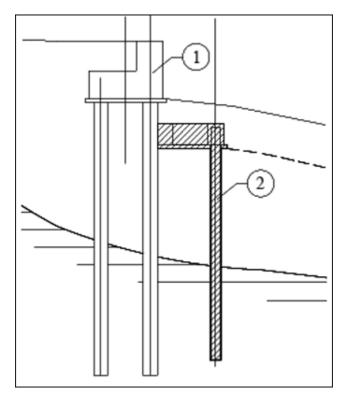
Cross section trough previously built pile wall (1) and new support structure (2)
